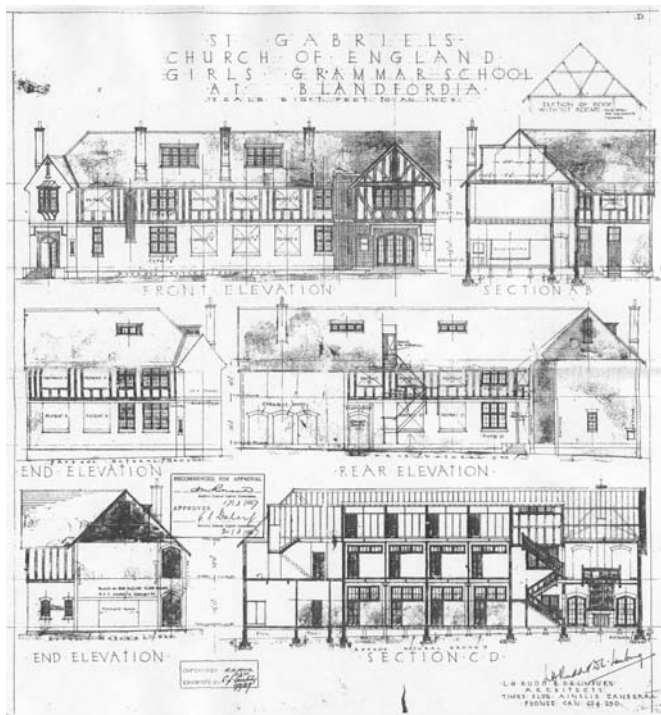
Original Elevations of Canberra Grammar School Boarding House (National Trust of Australia (ACT) files)
